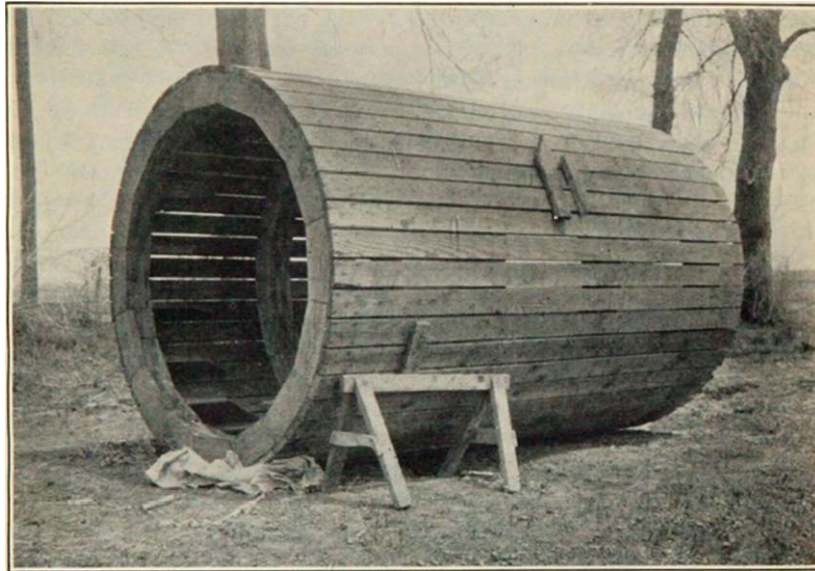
A timber shoe and strainer 8 feet in diameter and 10 feet long.
